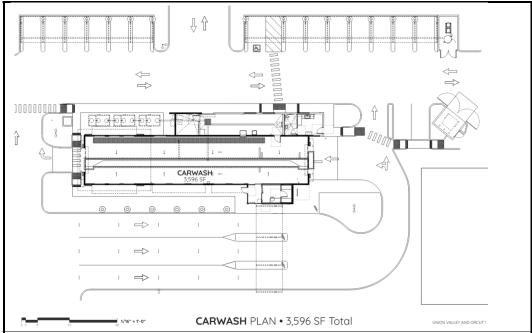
3,800 Sq. Ft. Floor Plan 3,800 sq. ft. floor plan included in the January 21, 2025 resubmittal (and incorrectly labeled 3,596 sq. ft.)
